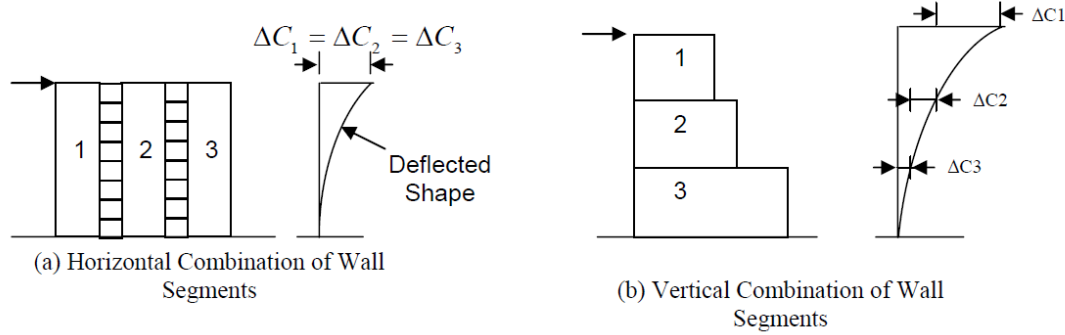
WALL COMBINATIONS FOR CALCULATING RIGIDITIES OF WALLS WITH OPENINGS
